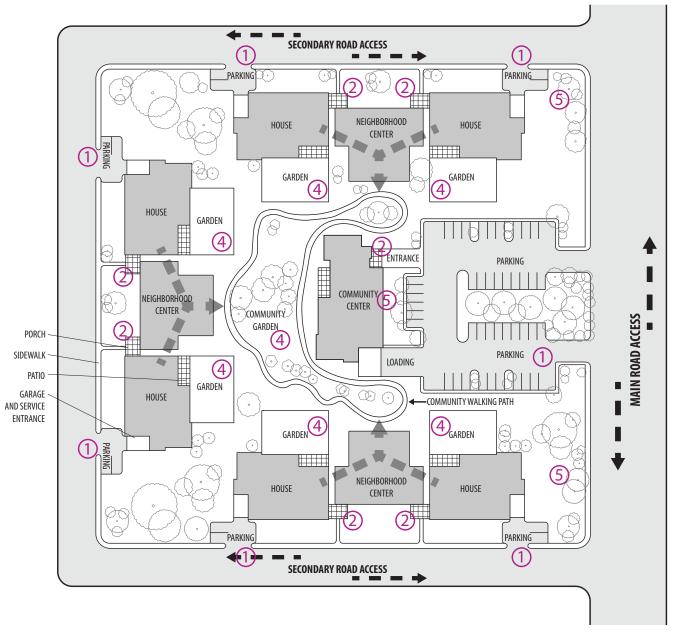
Example of a horizontally-organized (without vertical circulation) SH site plan, which shows the various site features described in the section above. Plan is not to scale.
